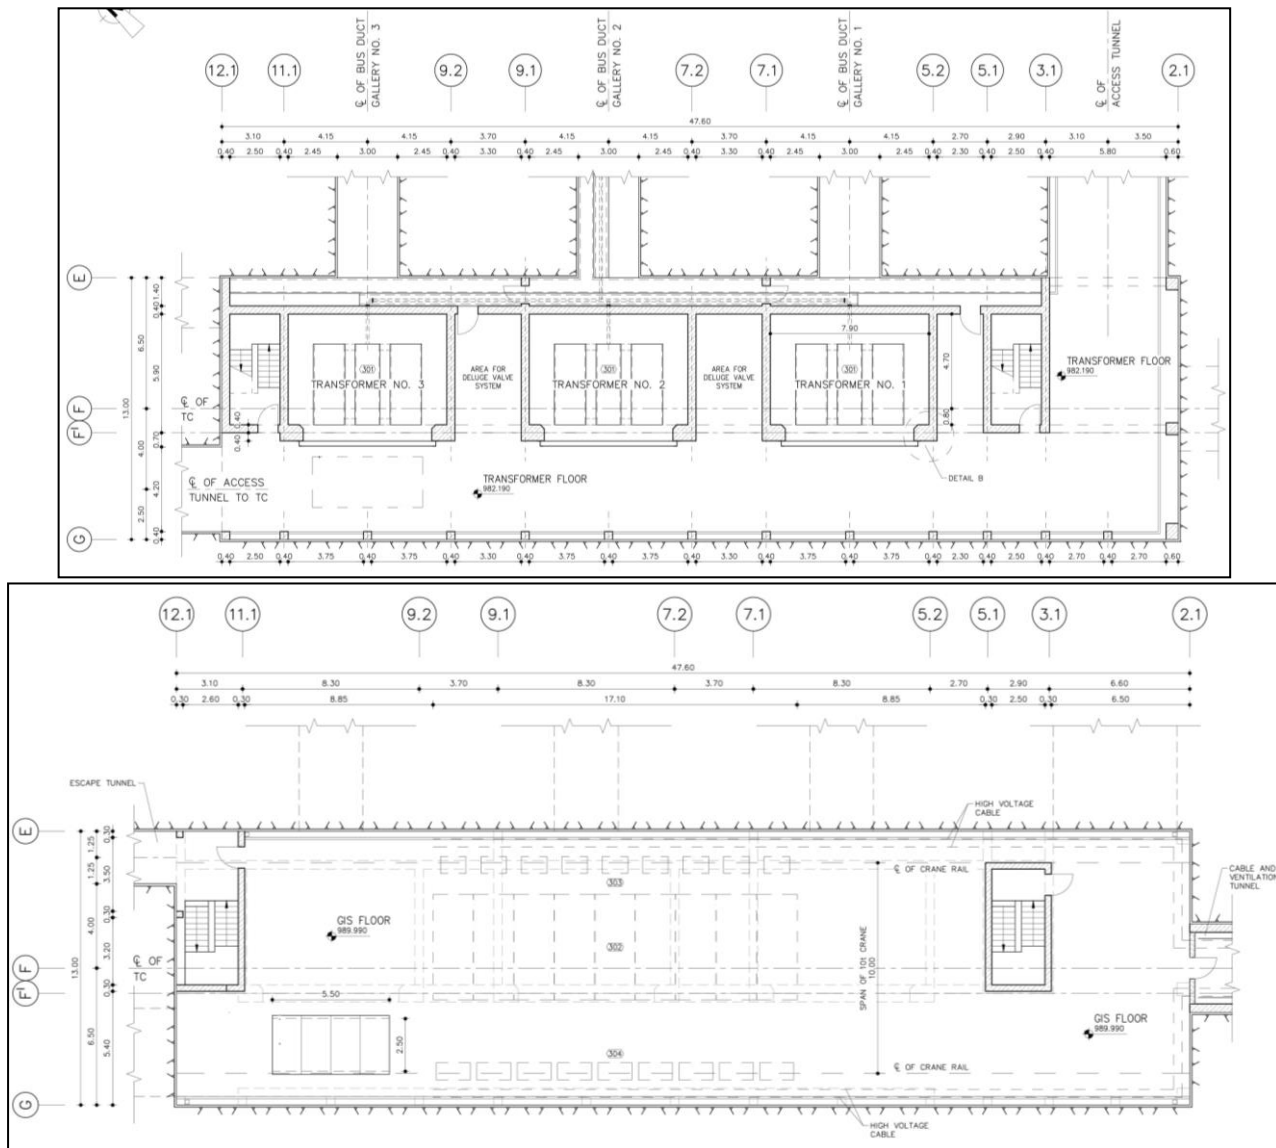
Plan of Transformer Floor (El. 982.19 m) and GIS Floor (El. 989.99 m)
